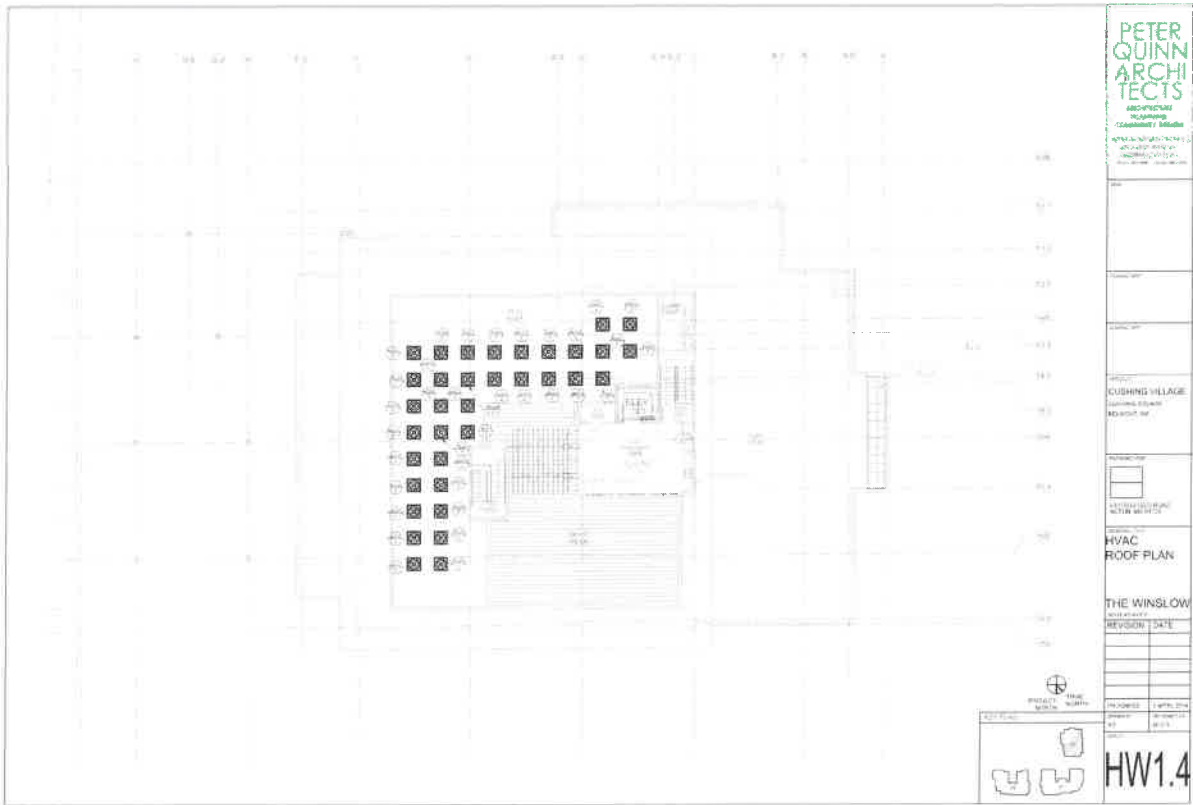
Winslow Building roof plan showing residential compressor/condenser units
